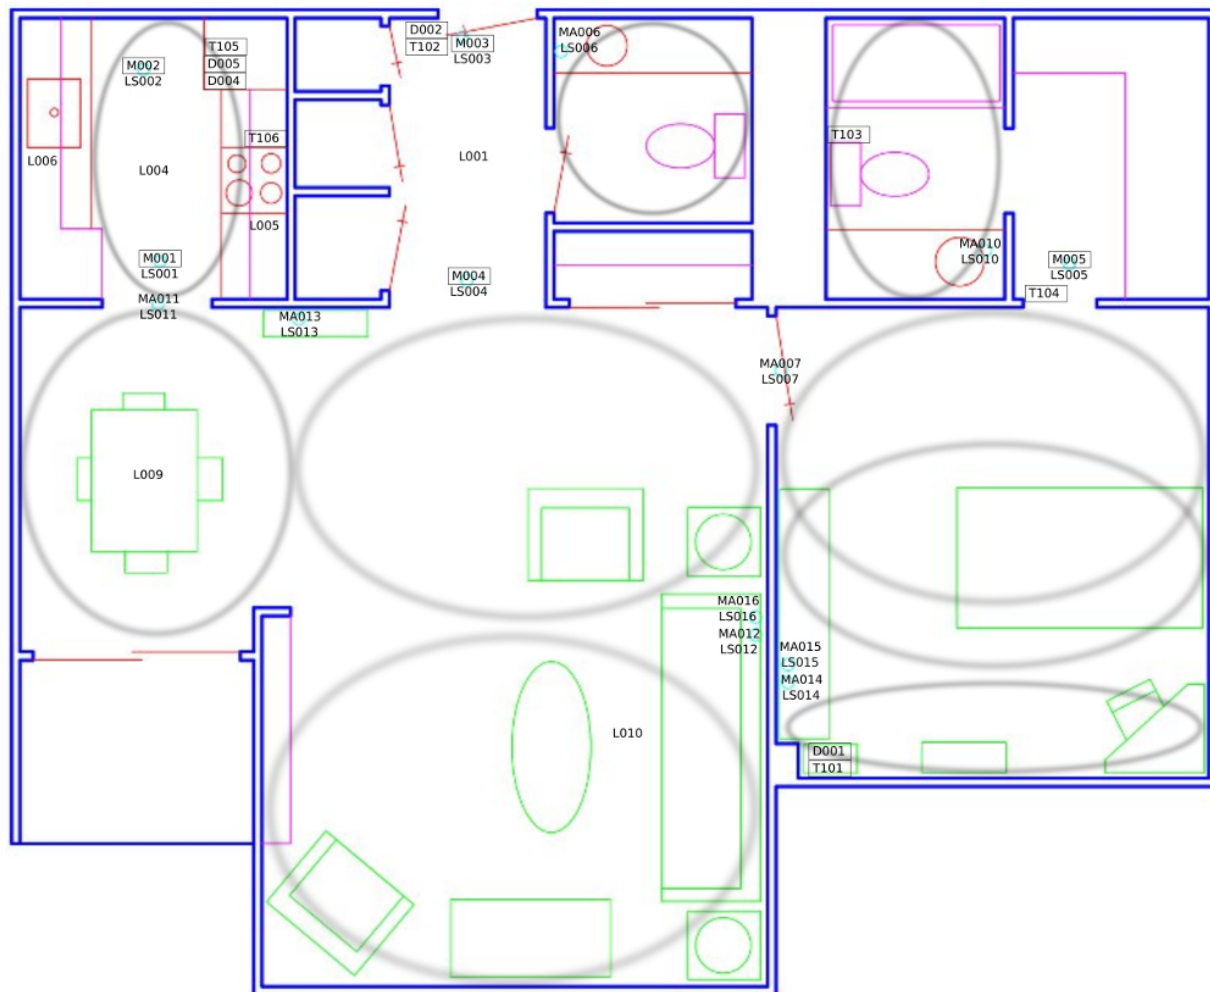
Floor plan and sensor placement for the testbed hh119.
